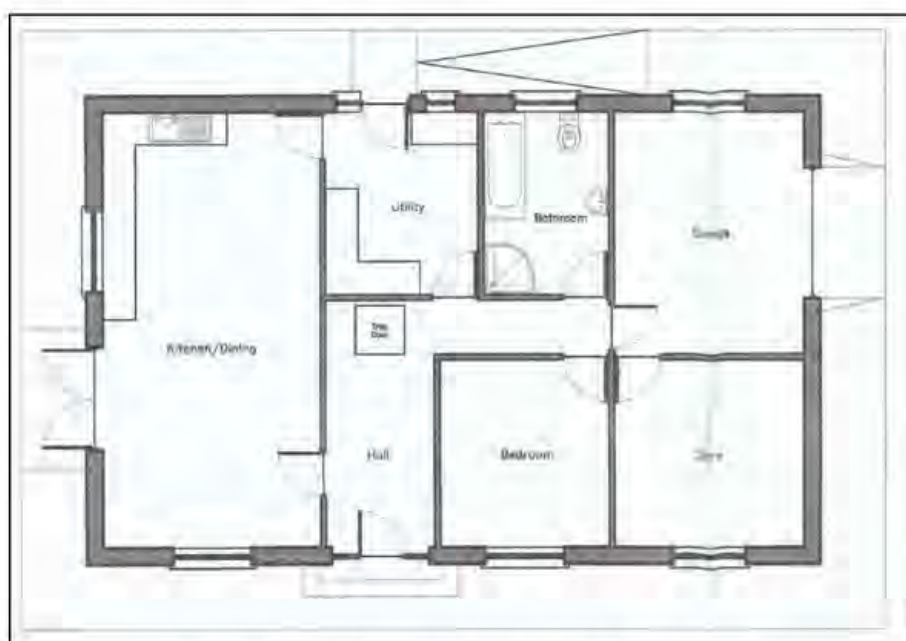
Proposed Floor Plan Received on 4th October 2016
